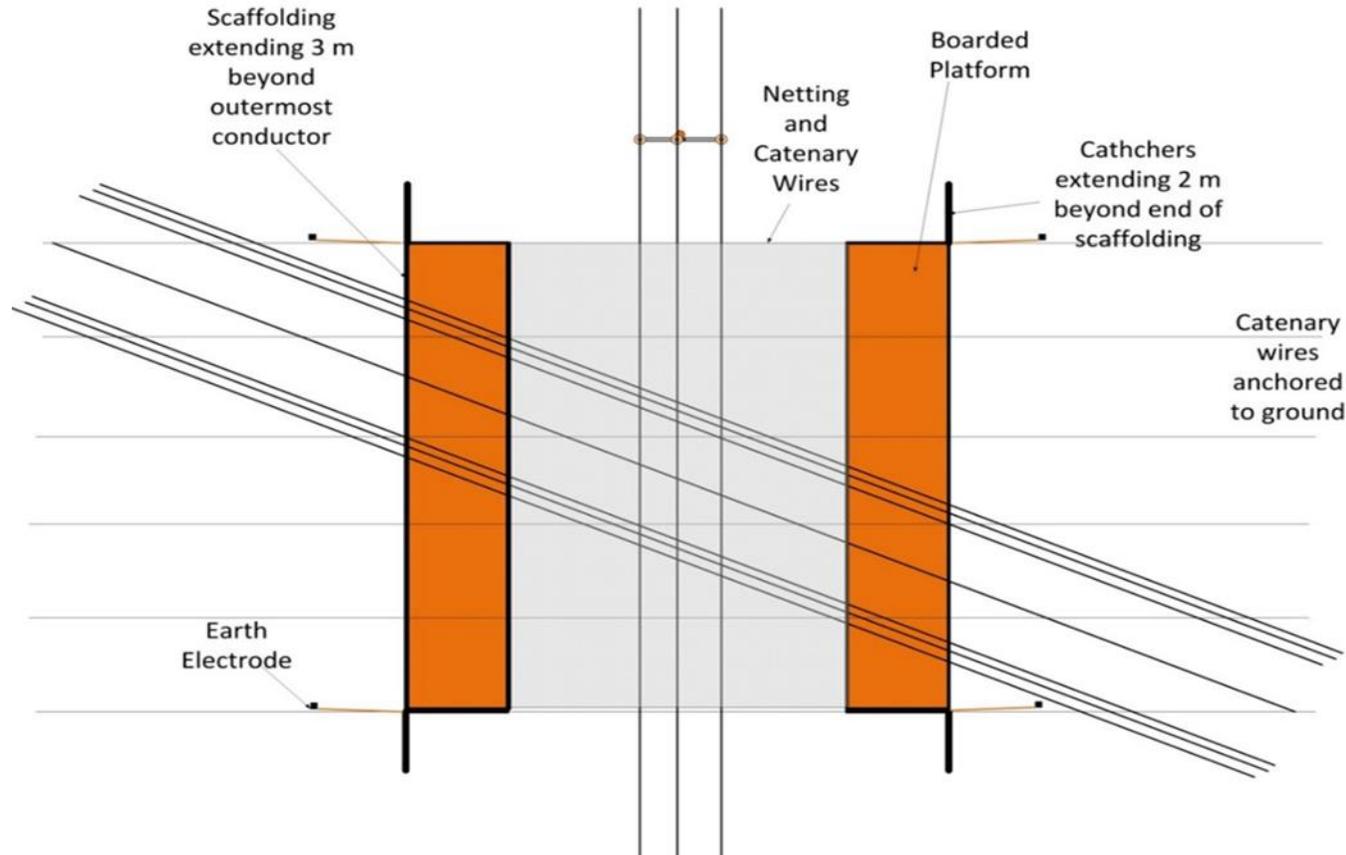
Plan of Scaffold and Netting over 11kV Crossing
